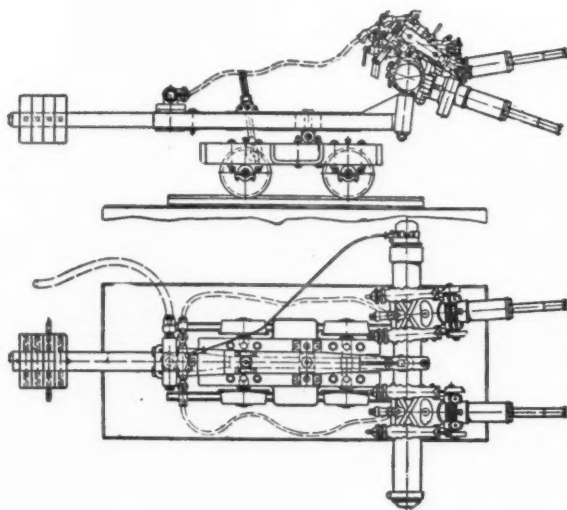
ELEVATION AND PLAN OF DRILL USED IN THE TUNNEL.
